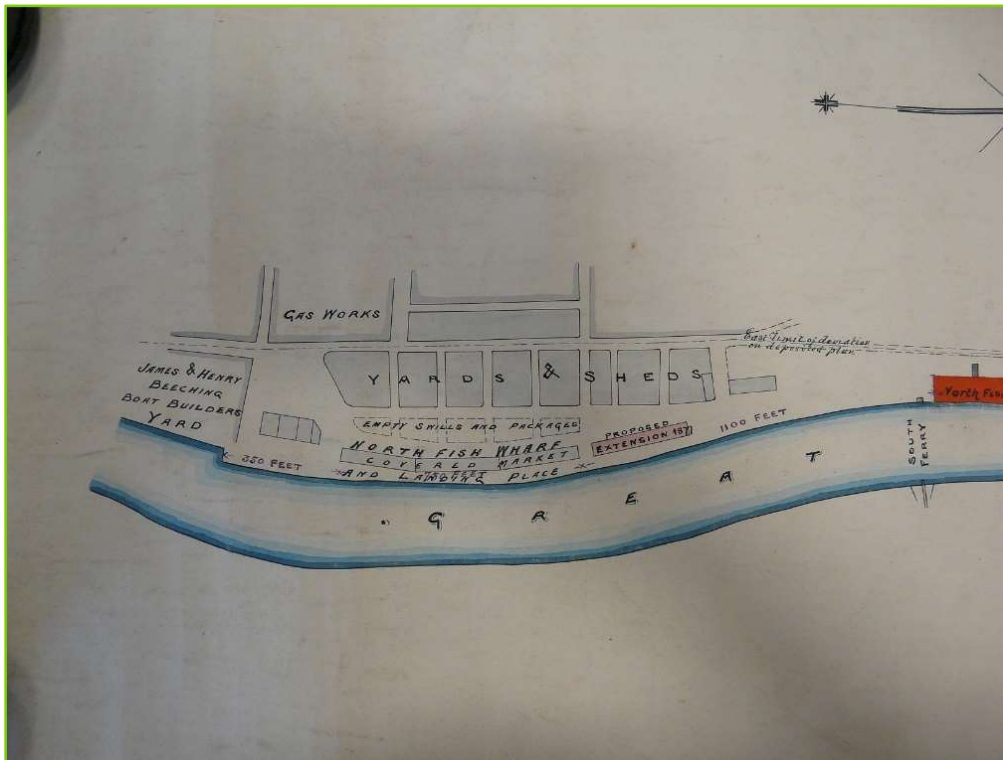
Proof Plan and Section of the Proposed Fish Wharf and Works 1866 (Norfolk Archives Ref. Y/PH 1200)
